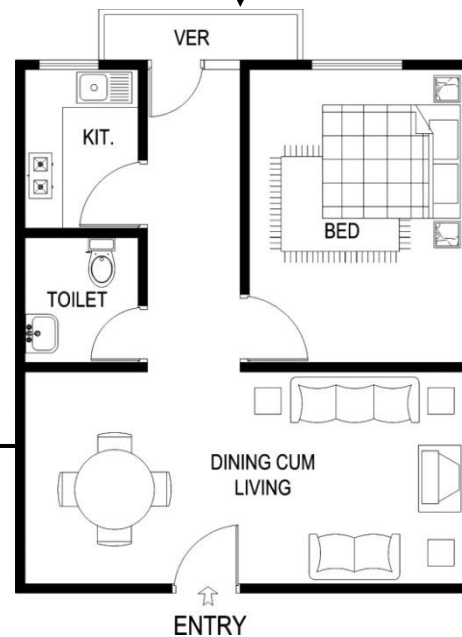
Unit Plan of R₅ Building, Rupali, Lake City Concord
